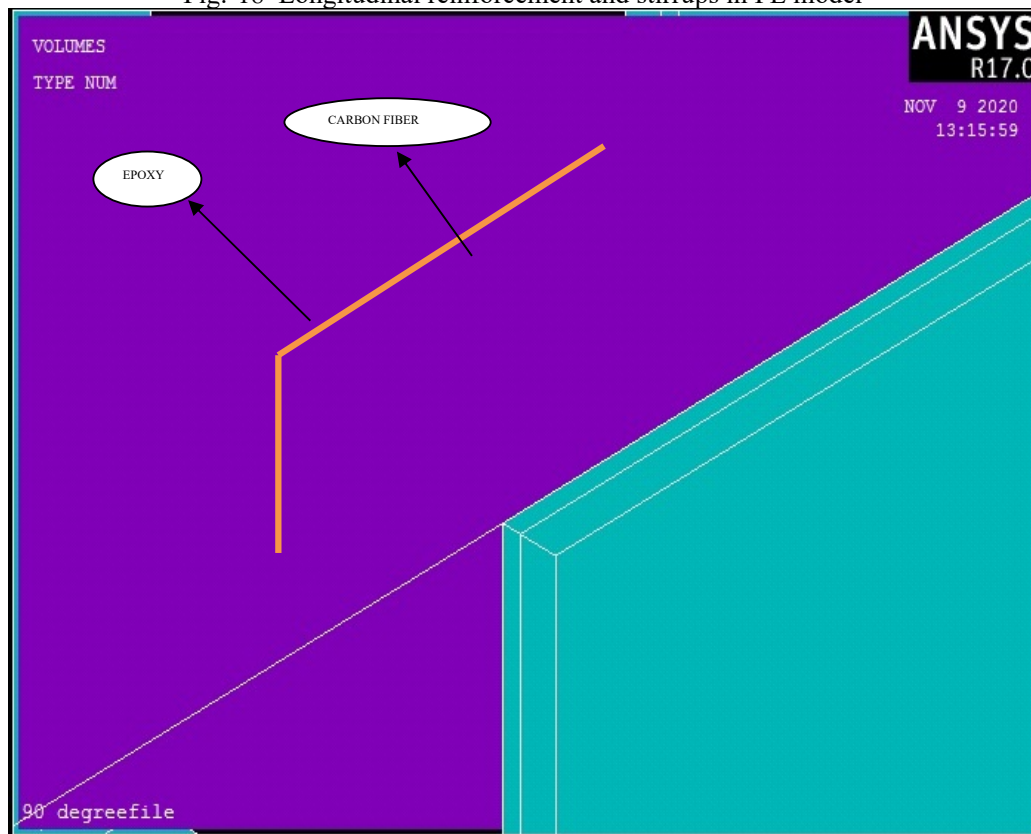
Modelling of single layered CFRP sheet and epoxy
